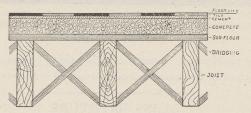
Tiles Laid on Beveled Joists and Floor.
